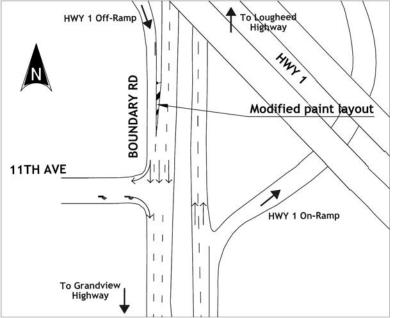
Boundary Road and 11th Avenue - Design Recommended by Staff
